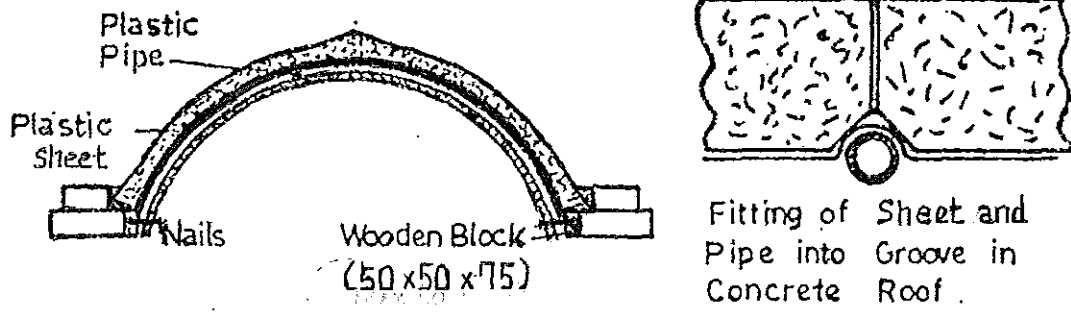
Use of Plastic Pipe to Hold Plastic Sheet in Place
